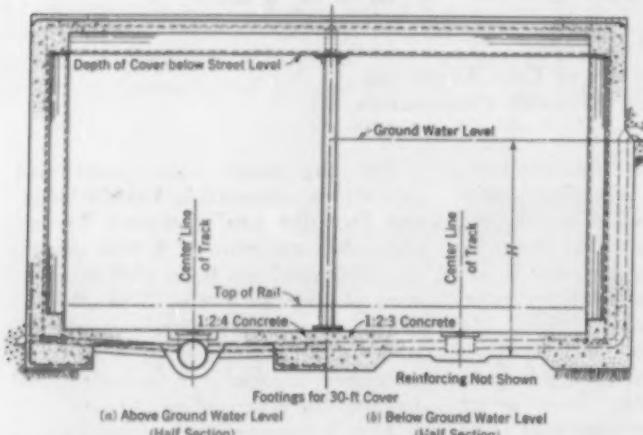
TYPICAL CROSS SECTIONS OF TWO-TRACK, CENTER-COLUMN SUBWAYS IN PHILADELPHIA
